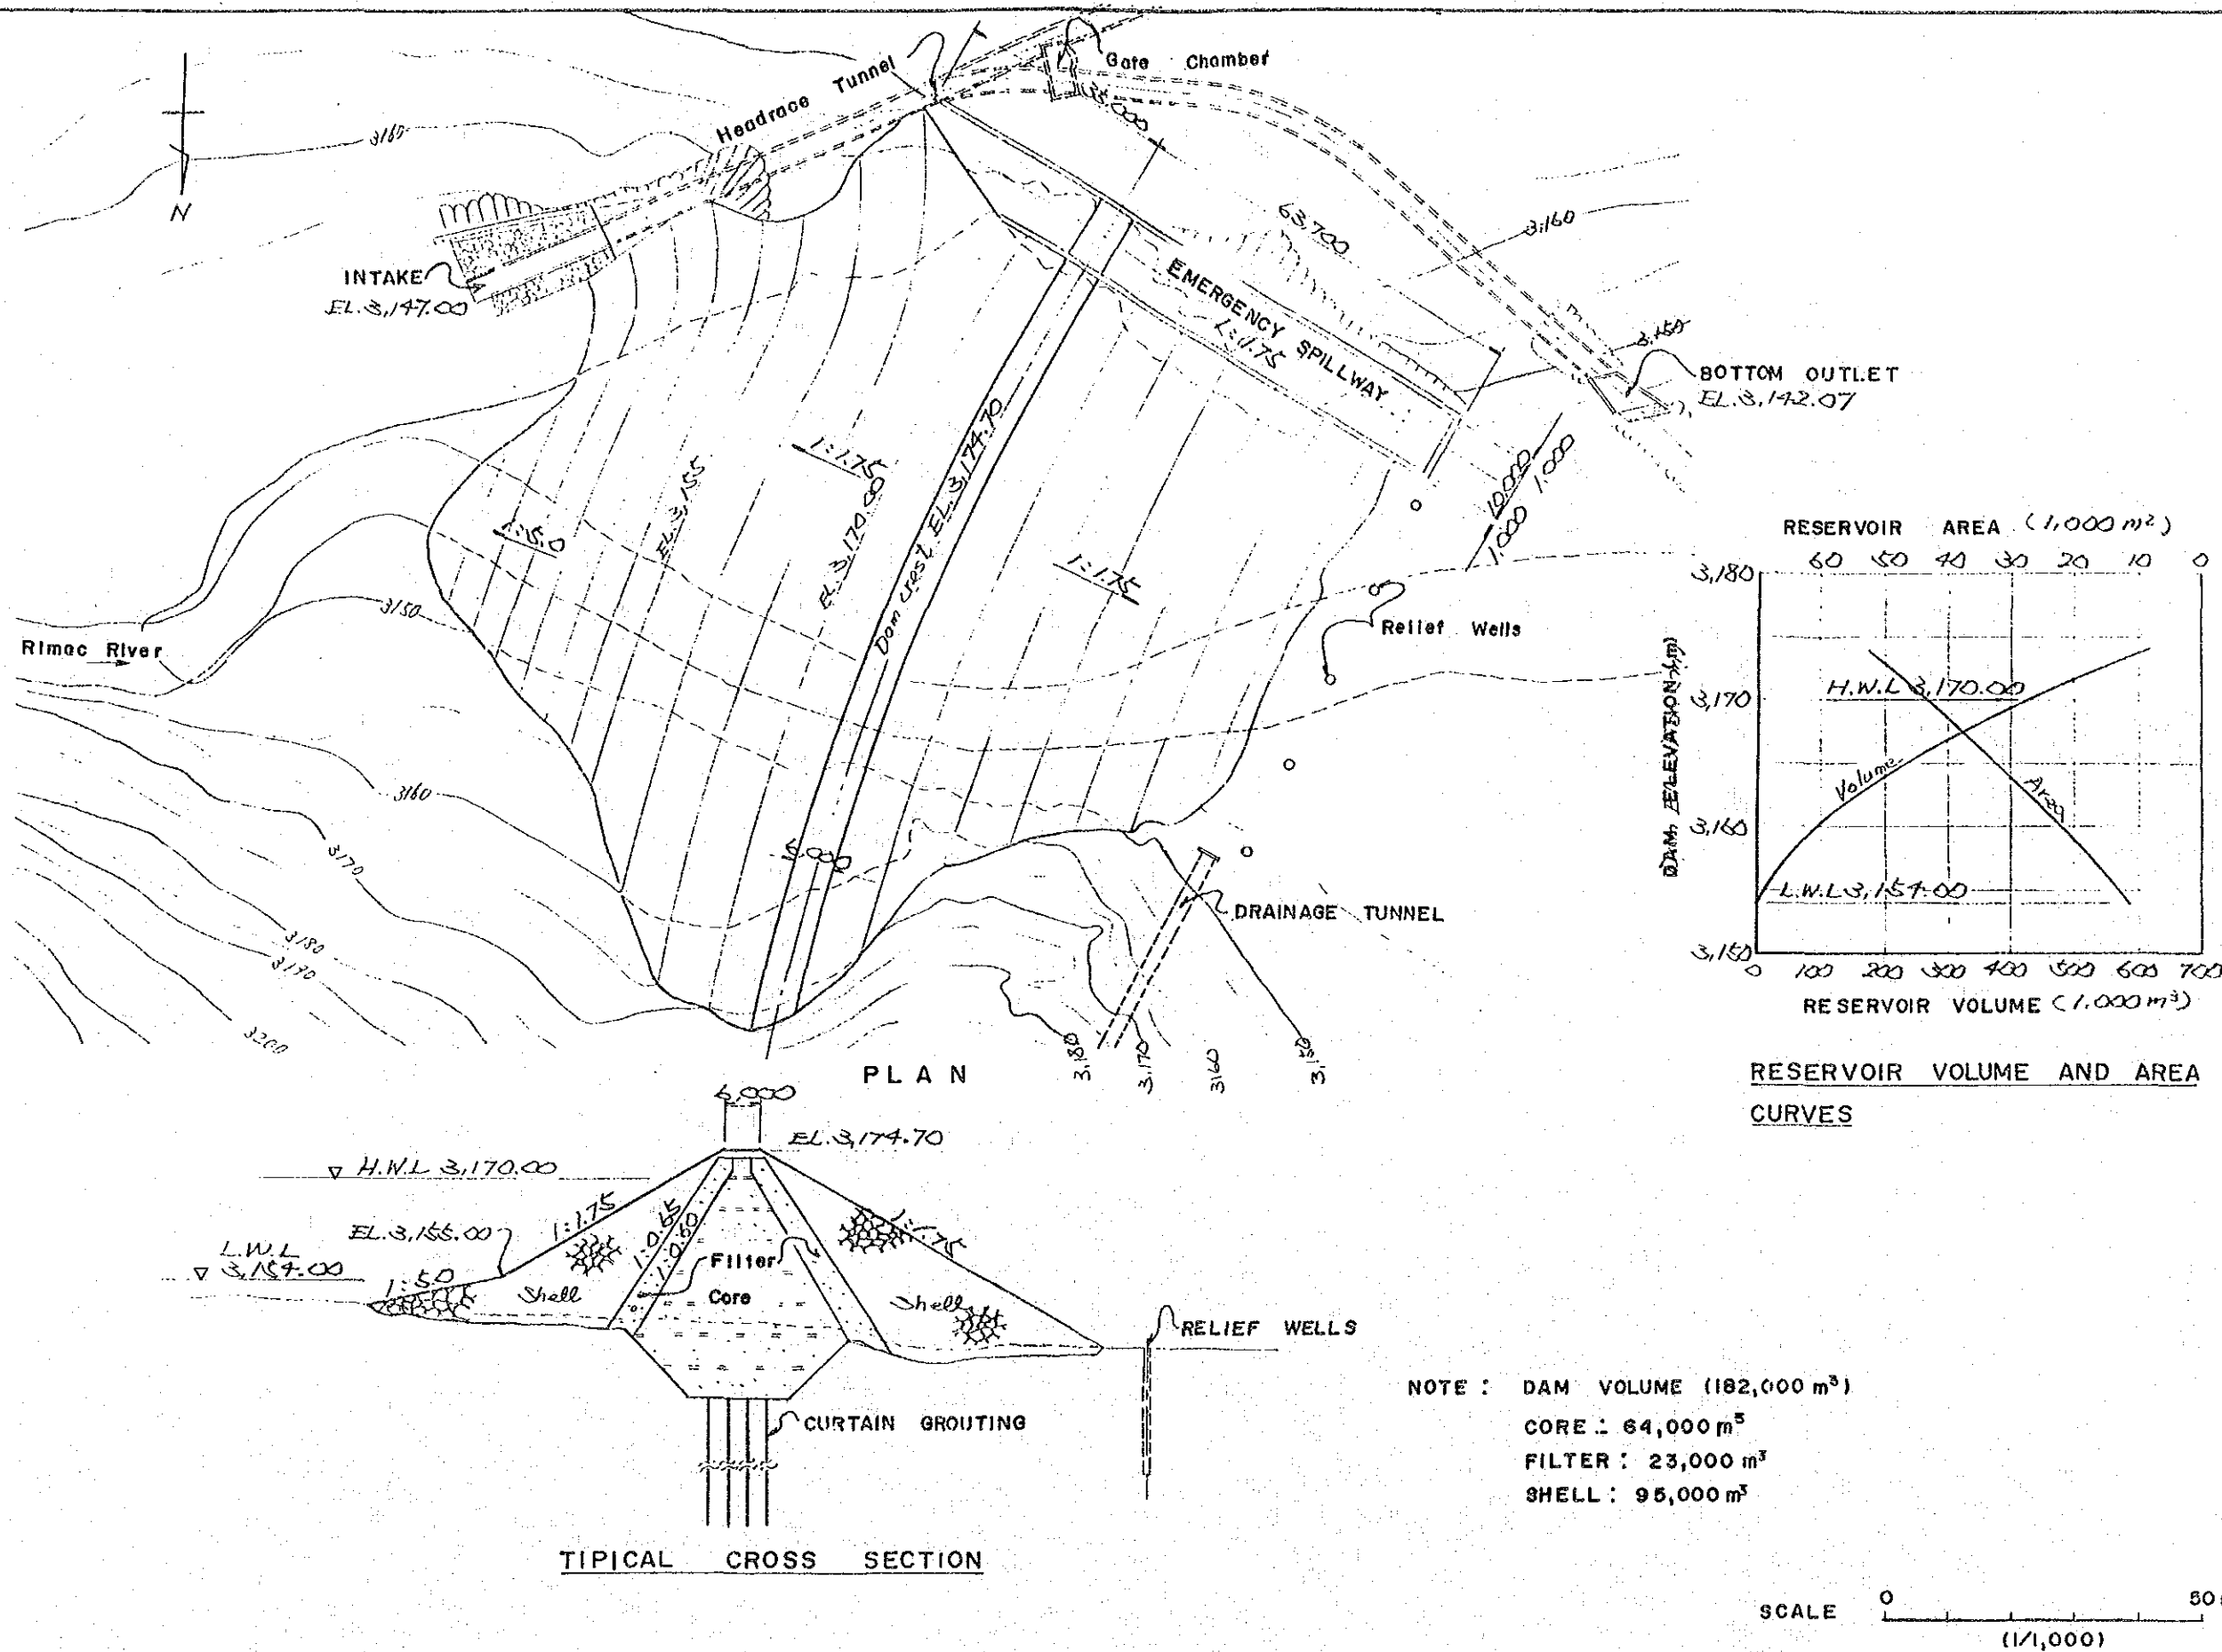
PLAN AND TYPICAL CROSS SECTION OF SHEQUE DAM
